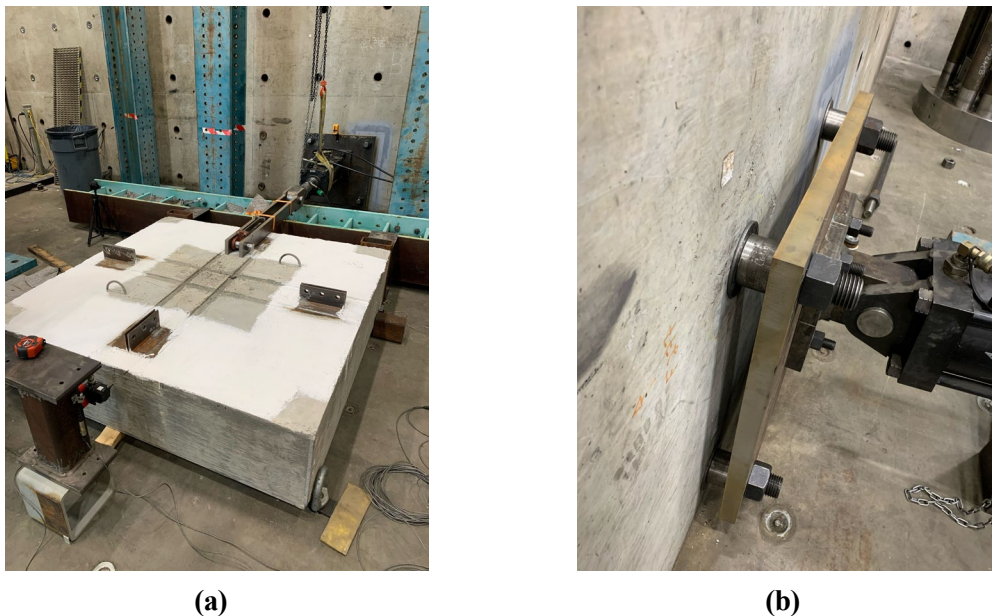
(a) Test setup prior to instrumentation installation and (b) pin connection between the jack and the strong wall
